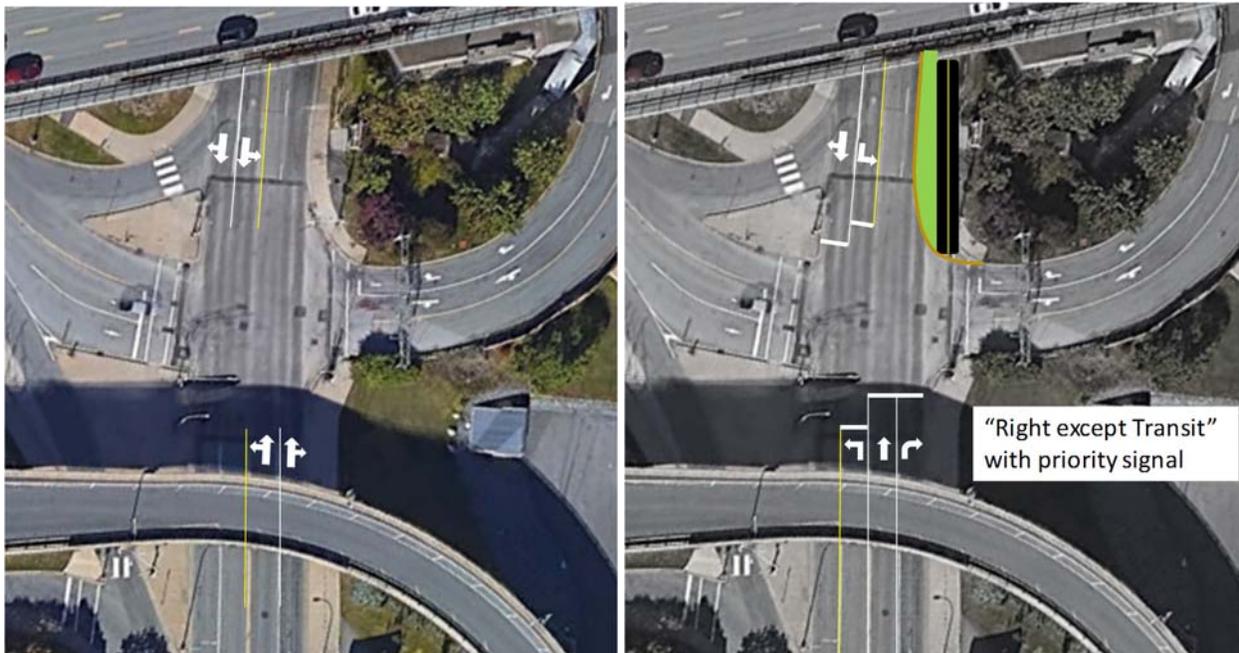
Existing (left) prior to the current construction project and proposed (right) configuration of the intersection of North Street and Barrington Street
